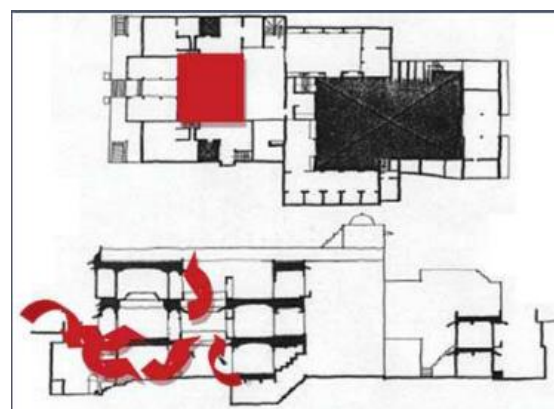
Typical Floor plan of Haveli in Rajasthan
